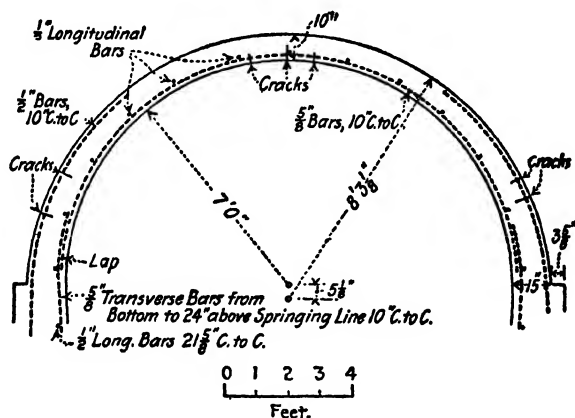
Cracks in sewer arch caused by excessive loading.
